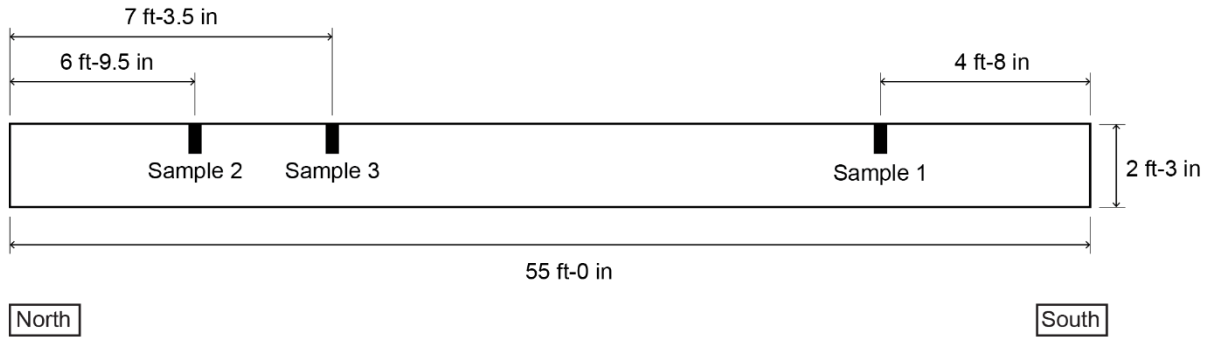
Location of Cores Taken from I-Beam 6. Elevation view of beam is shown.
